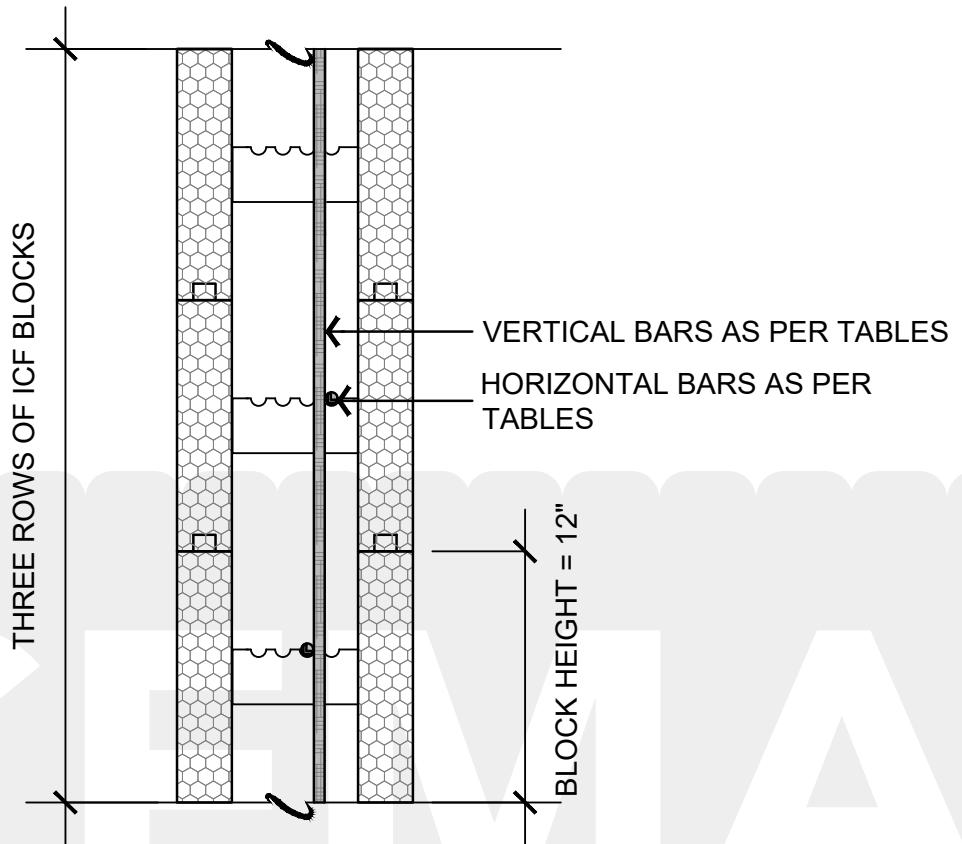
Below Grade Wall Reinforcing Placement for All Wall Thicknesses.
